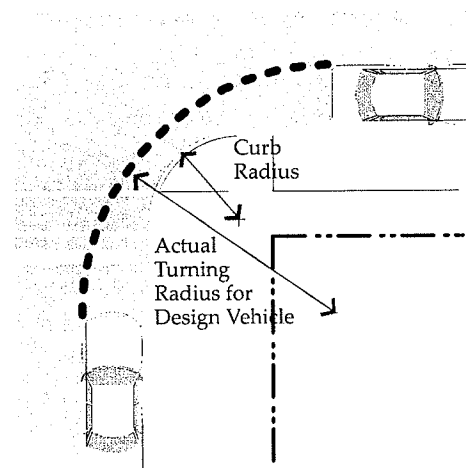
(d)-1. Actual Right Turn Radius with On-Street Parking.
